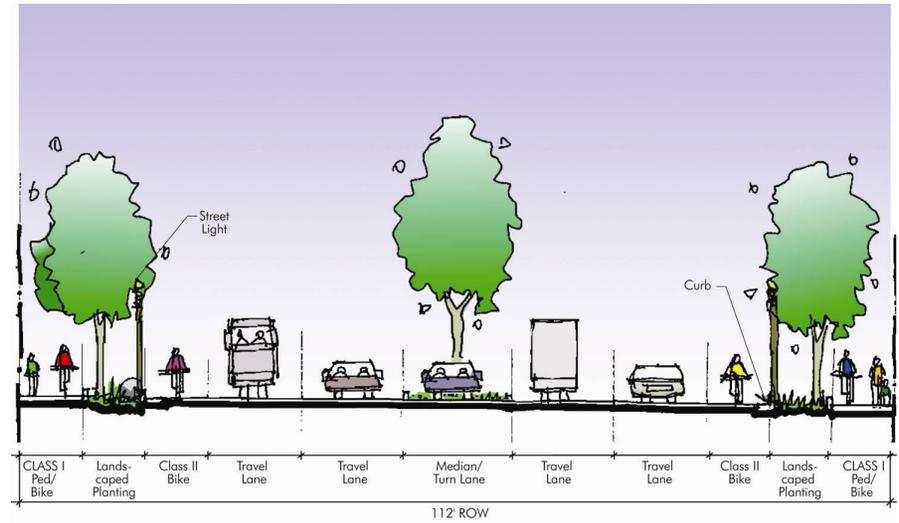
CROSS SECTION OF CORRIDOR WITH GENERAL PLAN IMPROVEMENTS
